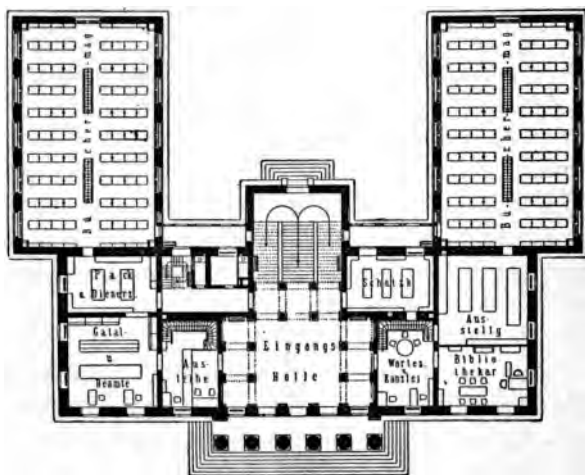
Ground floor plan of the State Library, Frankfurt.
